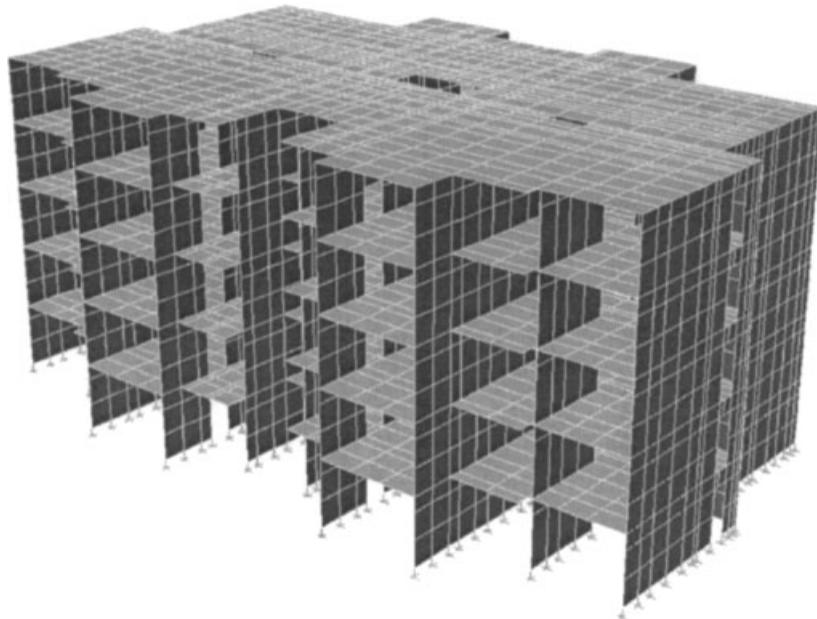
Typical three-dimensional mesh modelling for five-storey tunnel form building structure (Plan No. 2).
